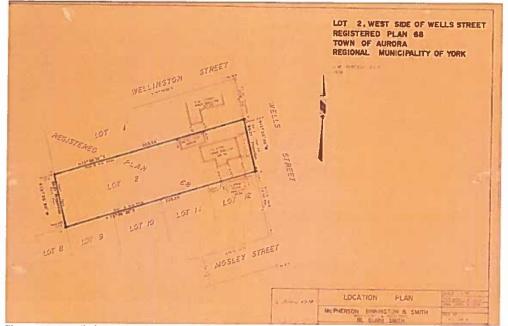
Detailed site plan for 32 Wells Street (J.M. Purcell OLS, 1978)
